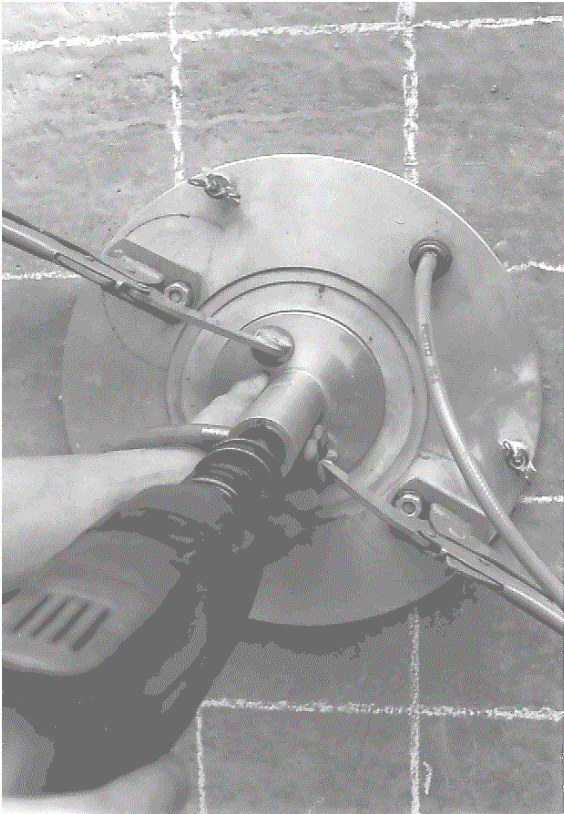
Drilling of the center hole with the drill unit attached to the vacuum plate.
